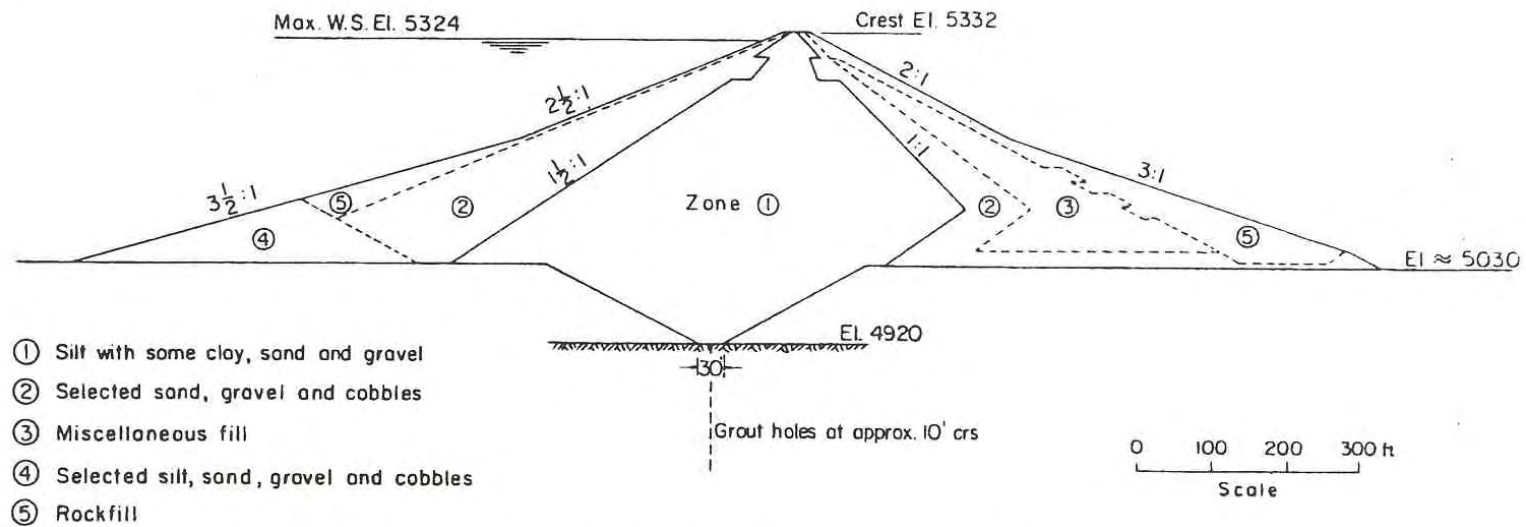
Cross-section through center portion of embankment founded on alluvium.
